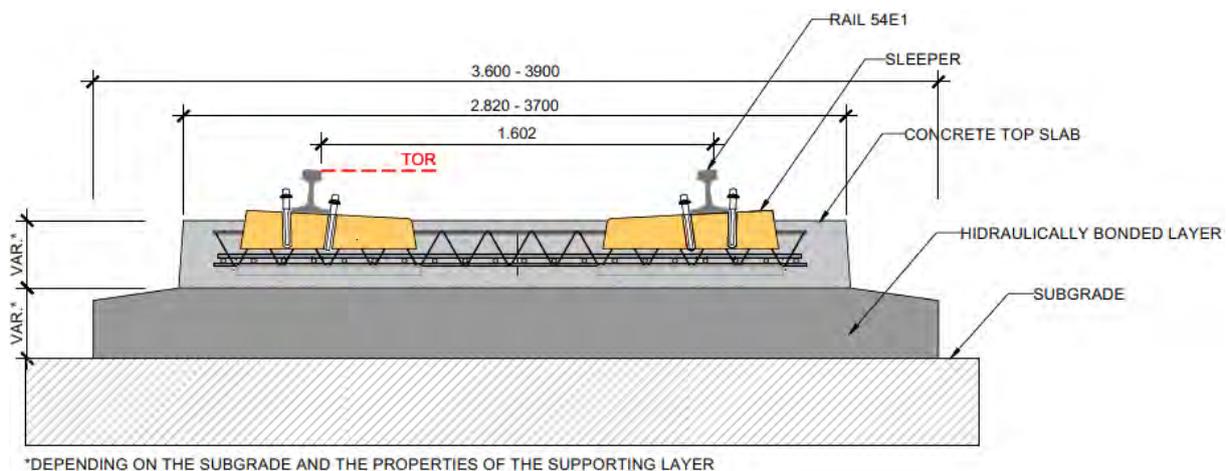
Schematic of concrete slab track (the concrete embedded sleeper solution shown is an example of the solution initially proposed in the report pending approval)
